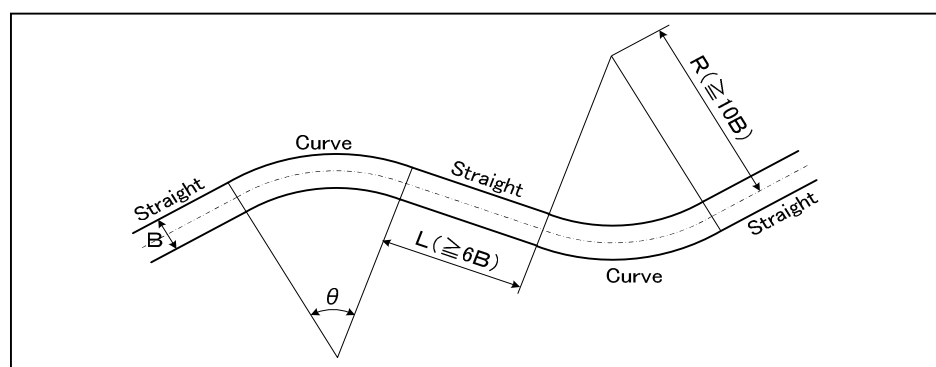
Illustration on How to Set the Center Line for Design
